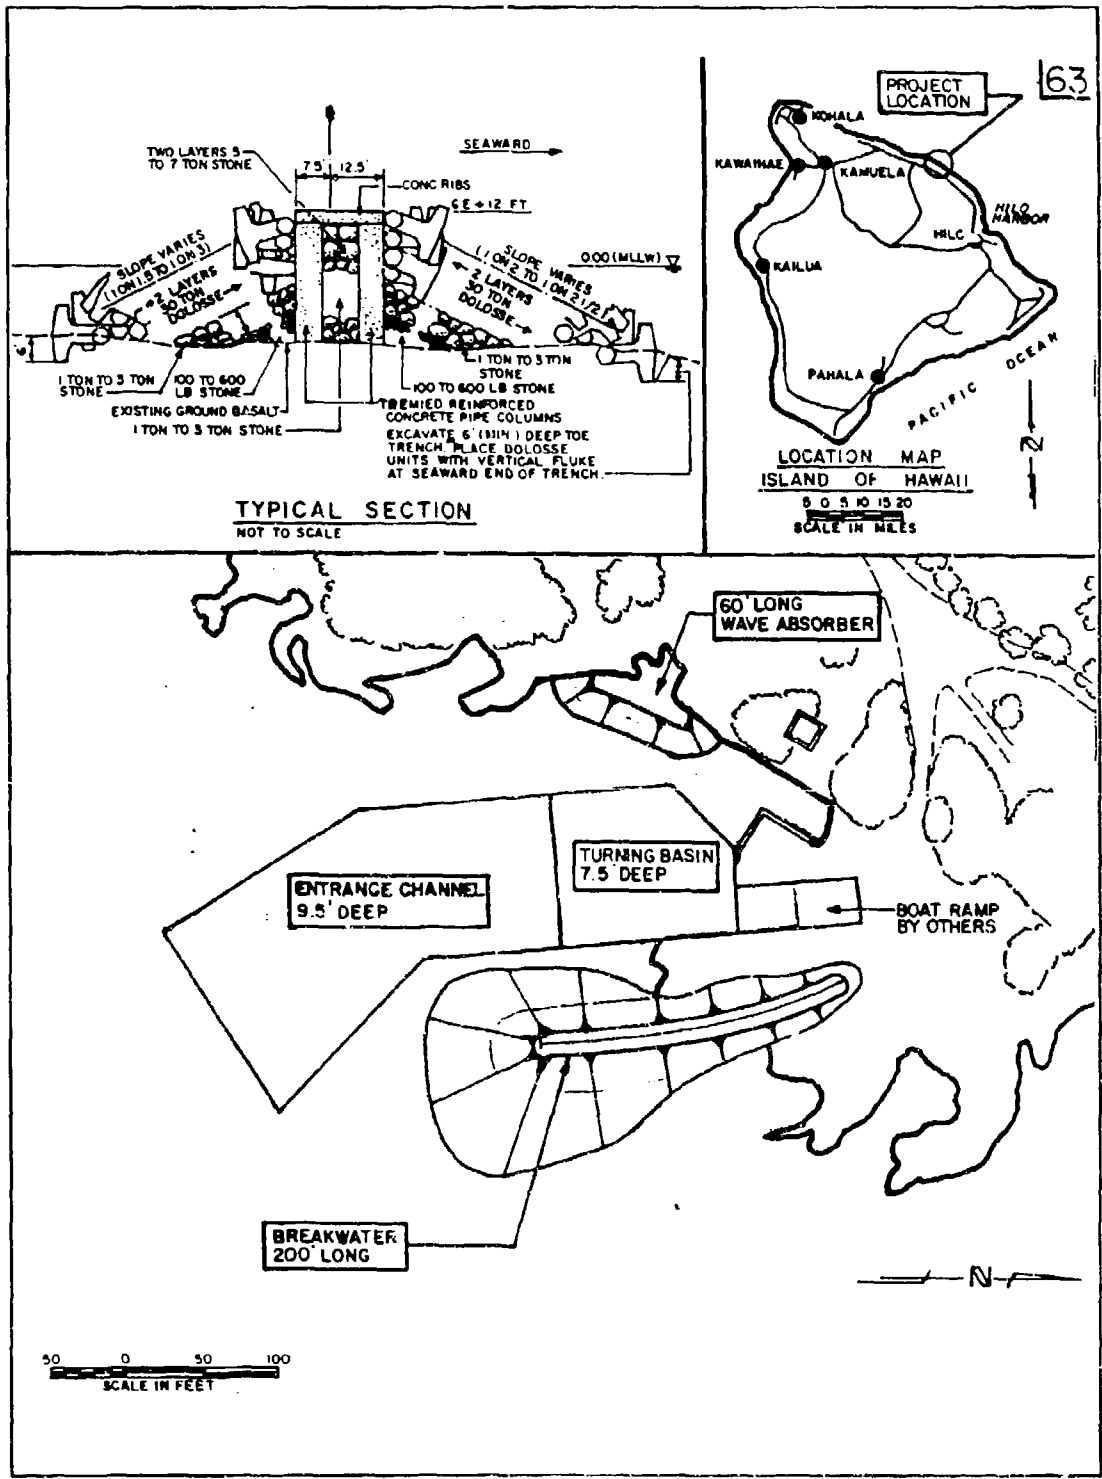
Detail plan layout and breakwater cross section for Laupahoehoe Boat Launching Facility
